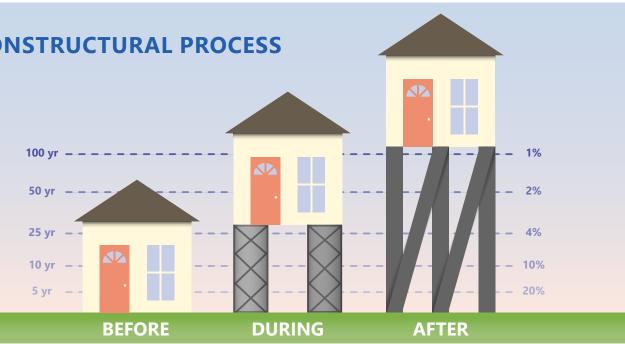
House Raising Strategy to remove structures from Flood Zones
